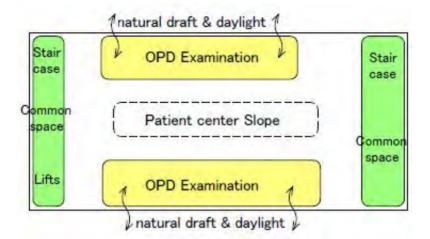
Zoning of the New OPD Building: 1F through 3F
